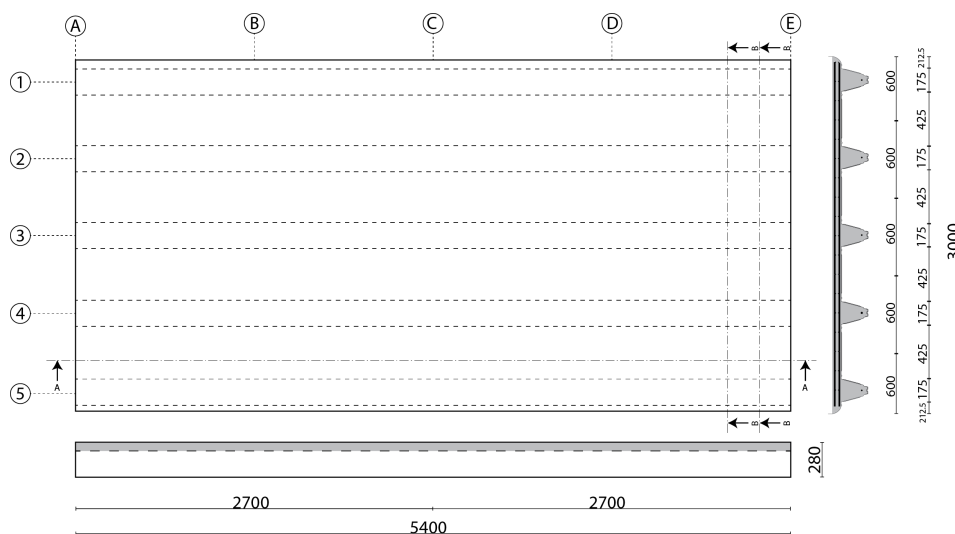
A top view of the general shape and dimensions of test pieces 1 to 3.
